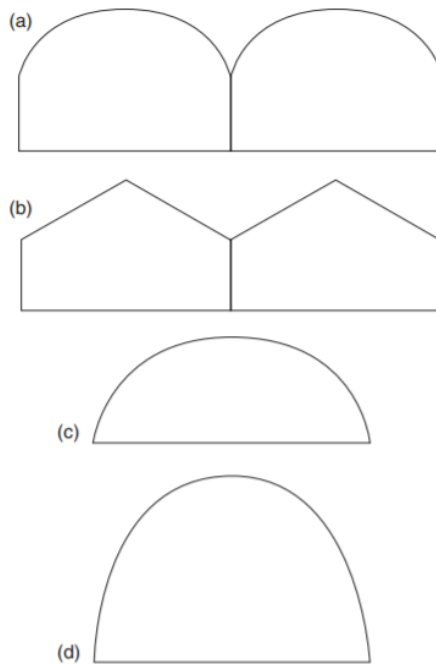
Greenhouse structures/shape: a) Gutter-connected straight sidewall with arch roof b) Gutter-connected straight sidewall with gable roof c) hoop style d) Gothic-arch frame. Source: (Peet and Welles, 2005)
